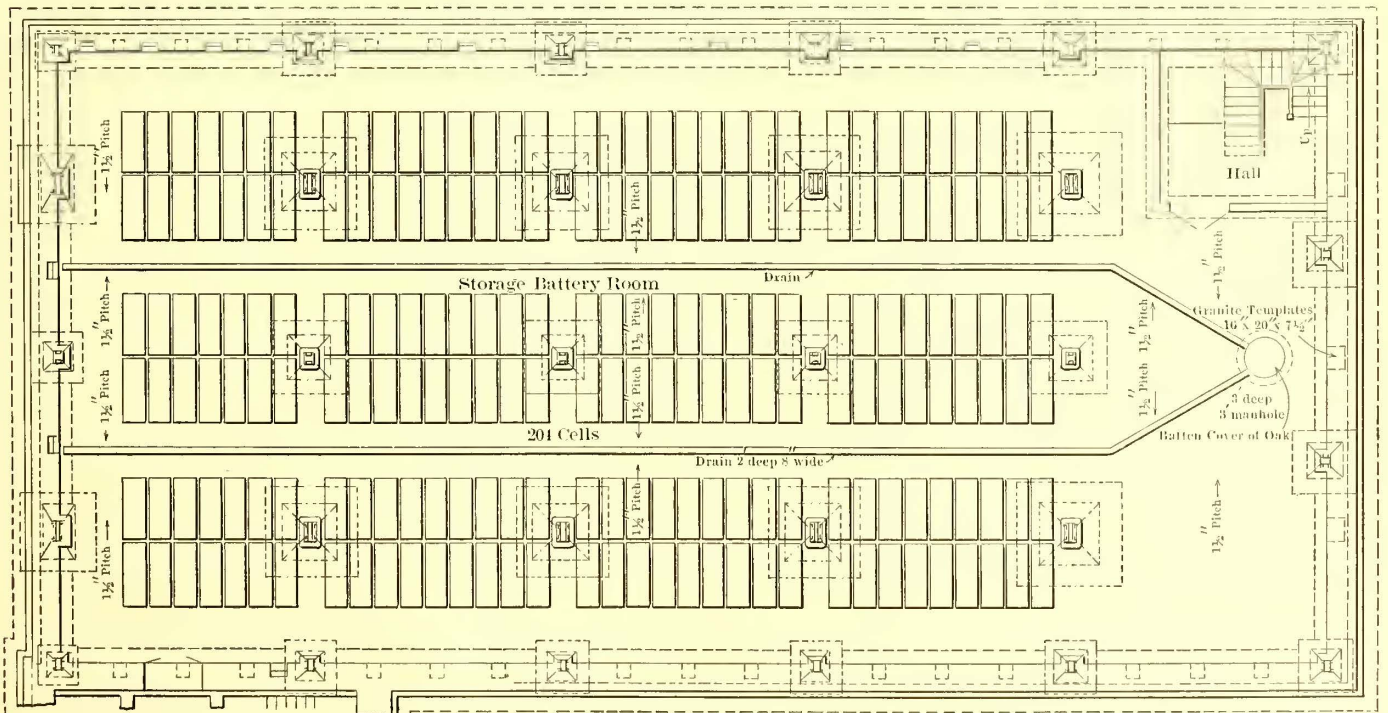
PLAN OF SUB-BASEMENT IN SUB-STATION NO. 4, ARRANGED FOR STORAGE BATTERIES
